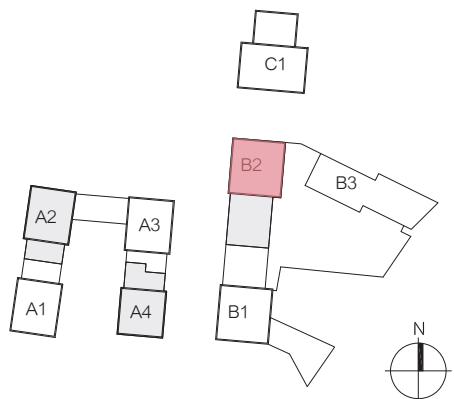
BUILDING B2 DESIGN ASSESSMENT
